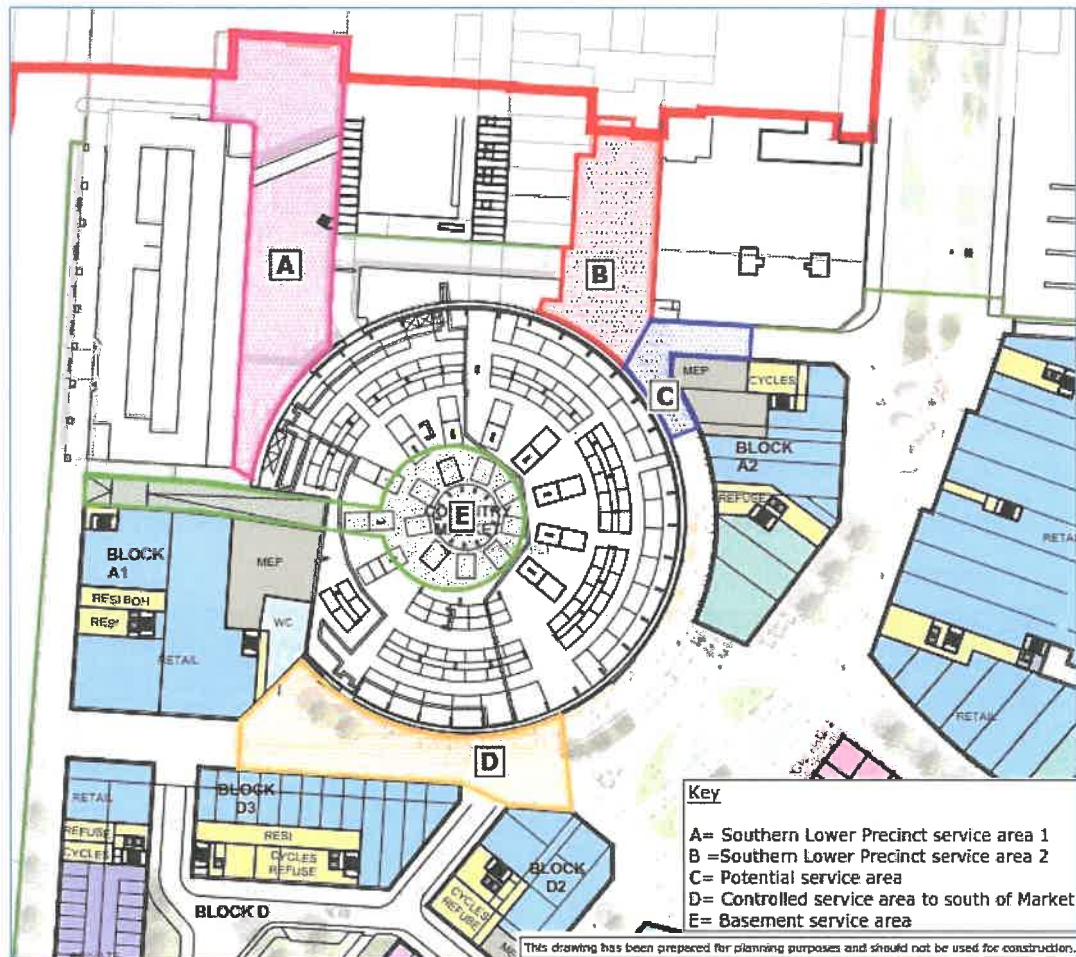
Proposed Site Layout (Source: TPP DSMP)
